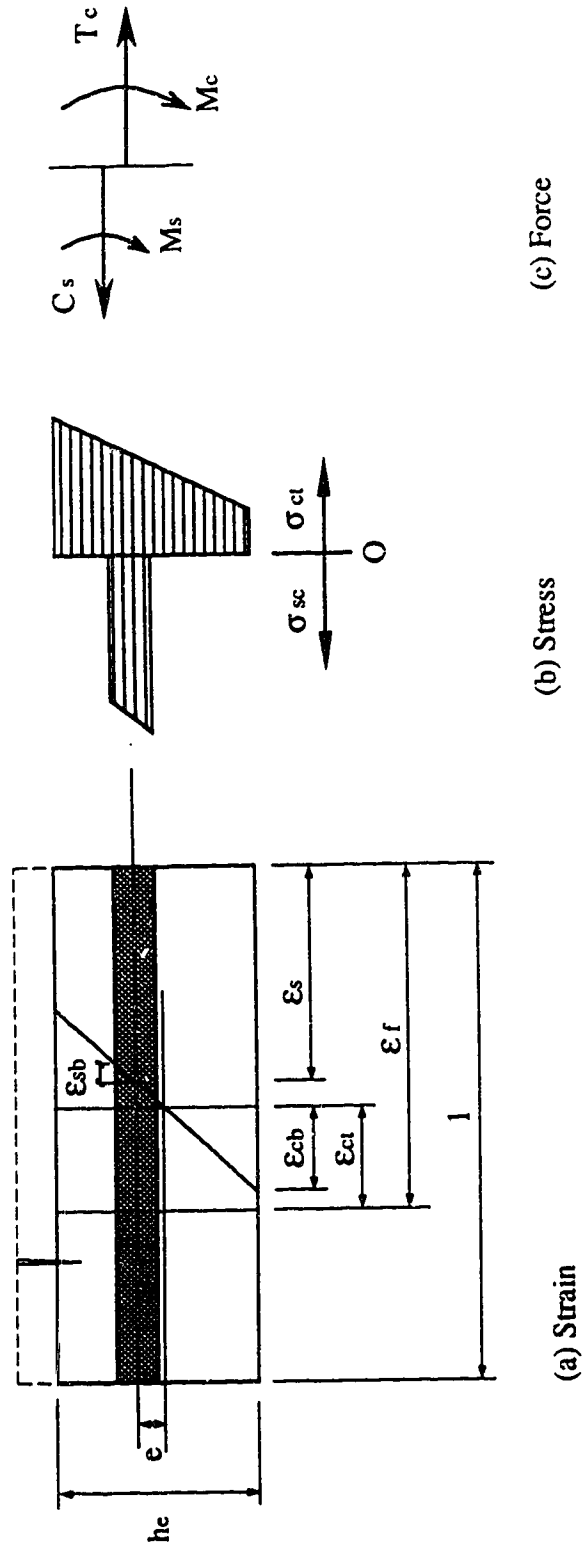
Strain, Stress, and Force Diagrams in a Cracked Reinforced Concrete Specimen
